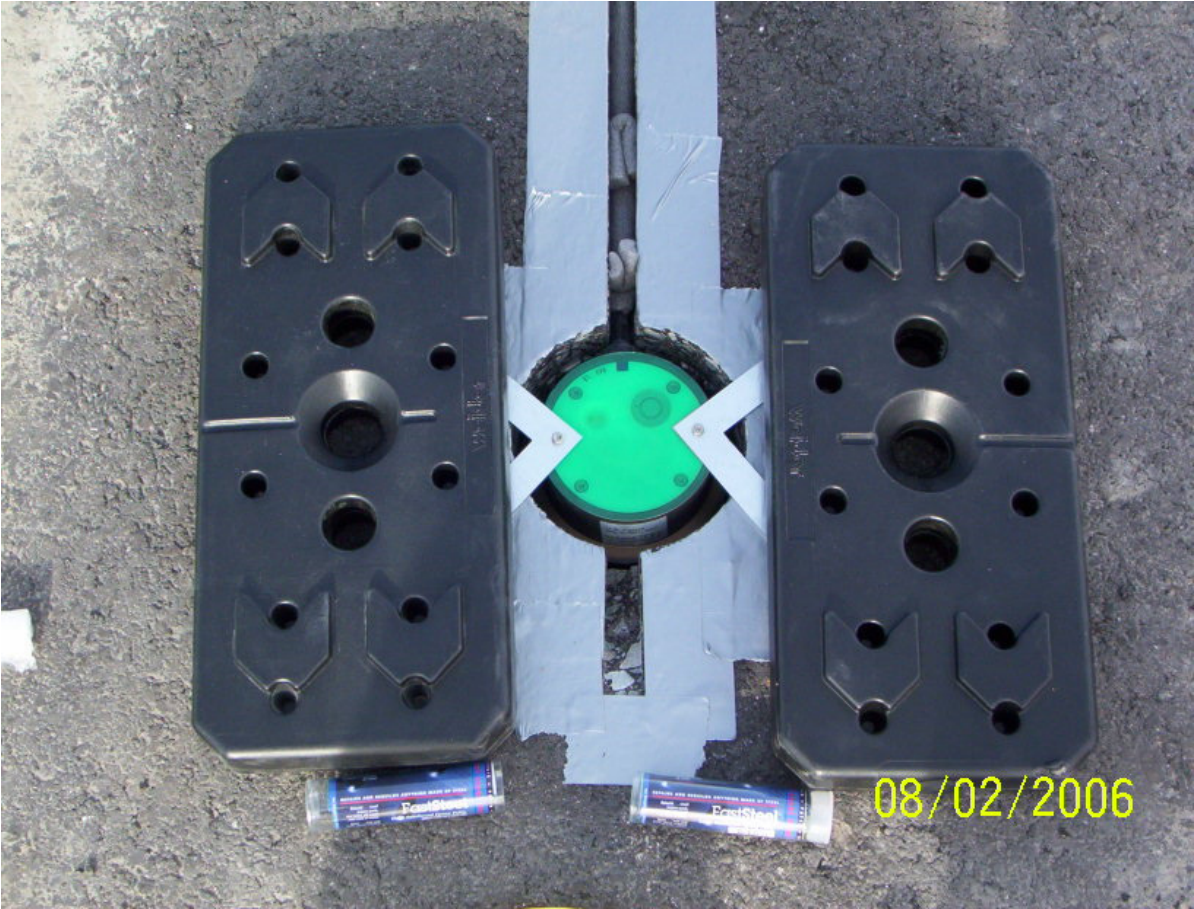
Weights are placed onto the leveling fixtures for the road sensor. One weight is placed on each leveling fixture.
